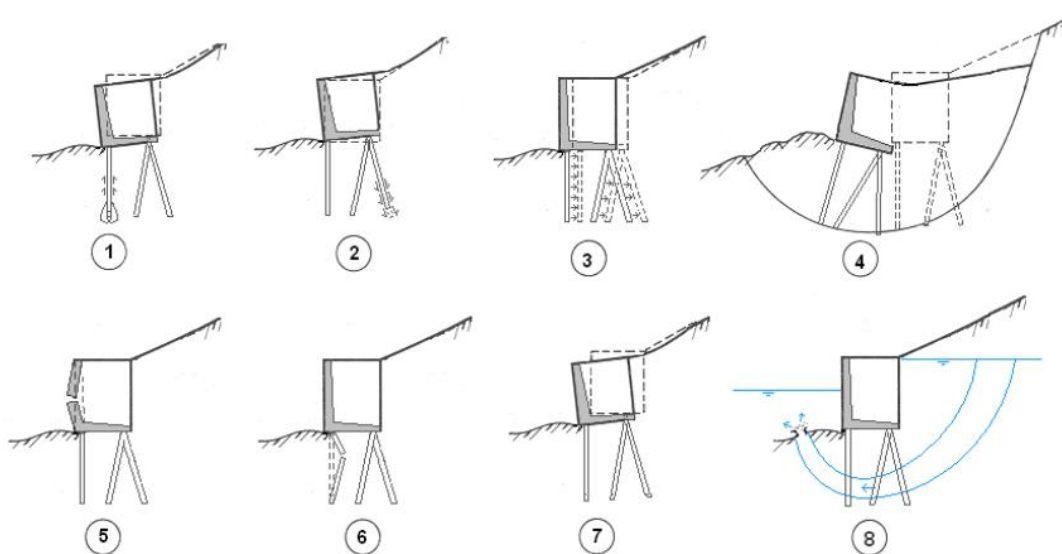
several failure mechanisms of a gravity wall (CUR commissie c186, 2013).
